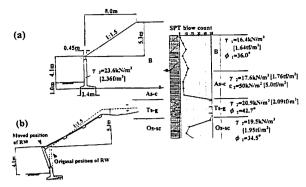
Rupture of the facing of cantilever-type RC RW along embankment of JR Shin-Nagata Station (Site CL2 in Fig. 2); (a) cross section (see Fig. 7 for notation of γ and φ) and (b) sketch
